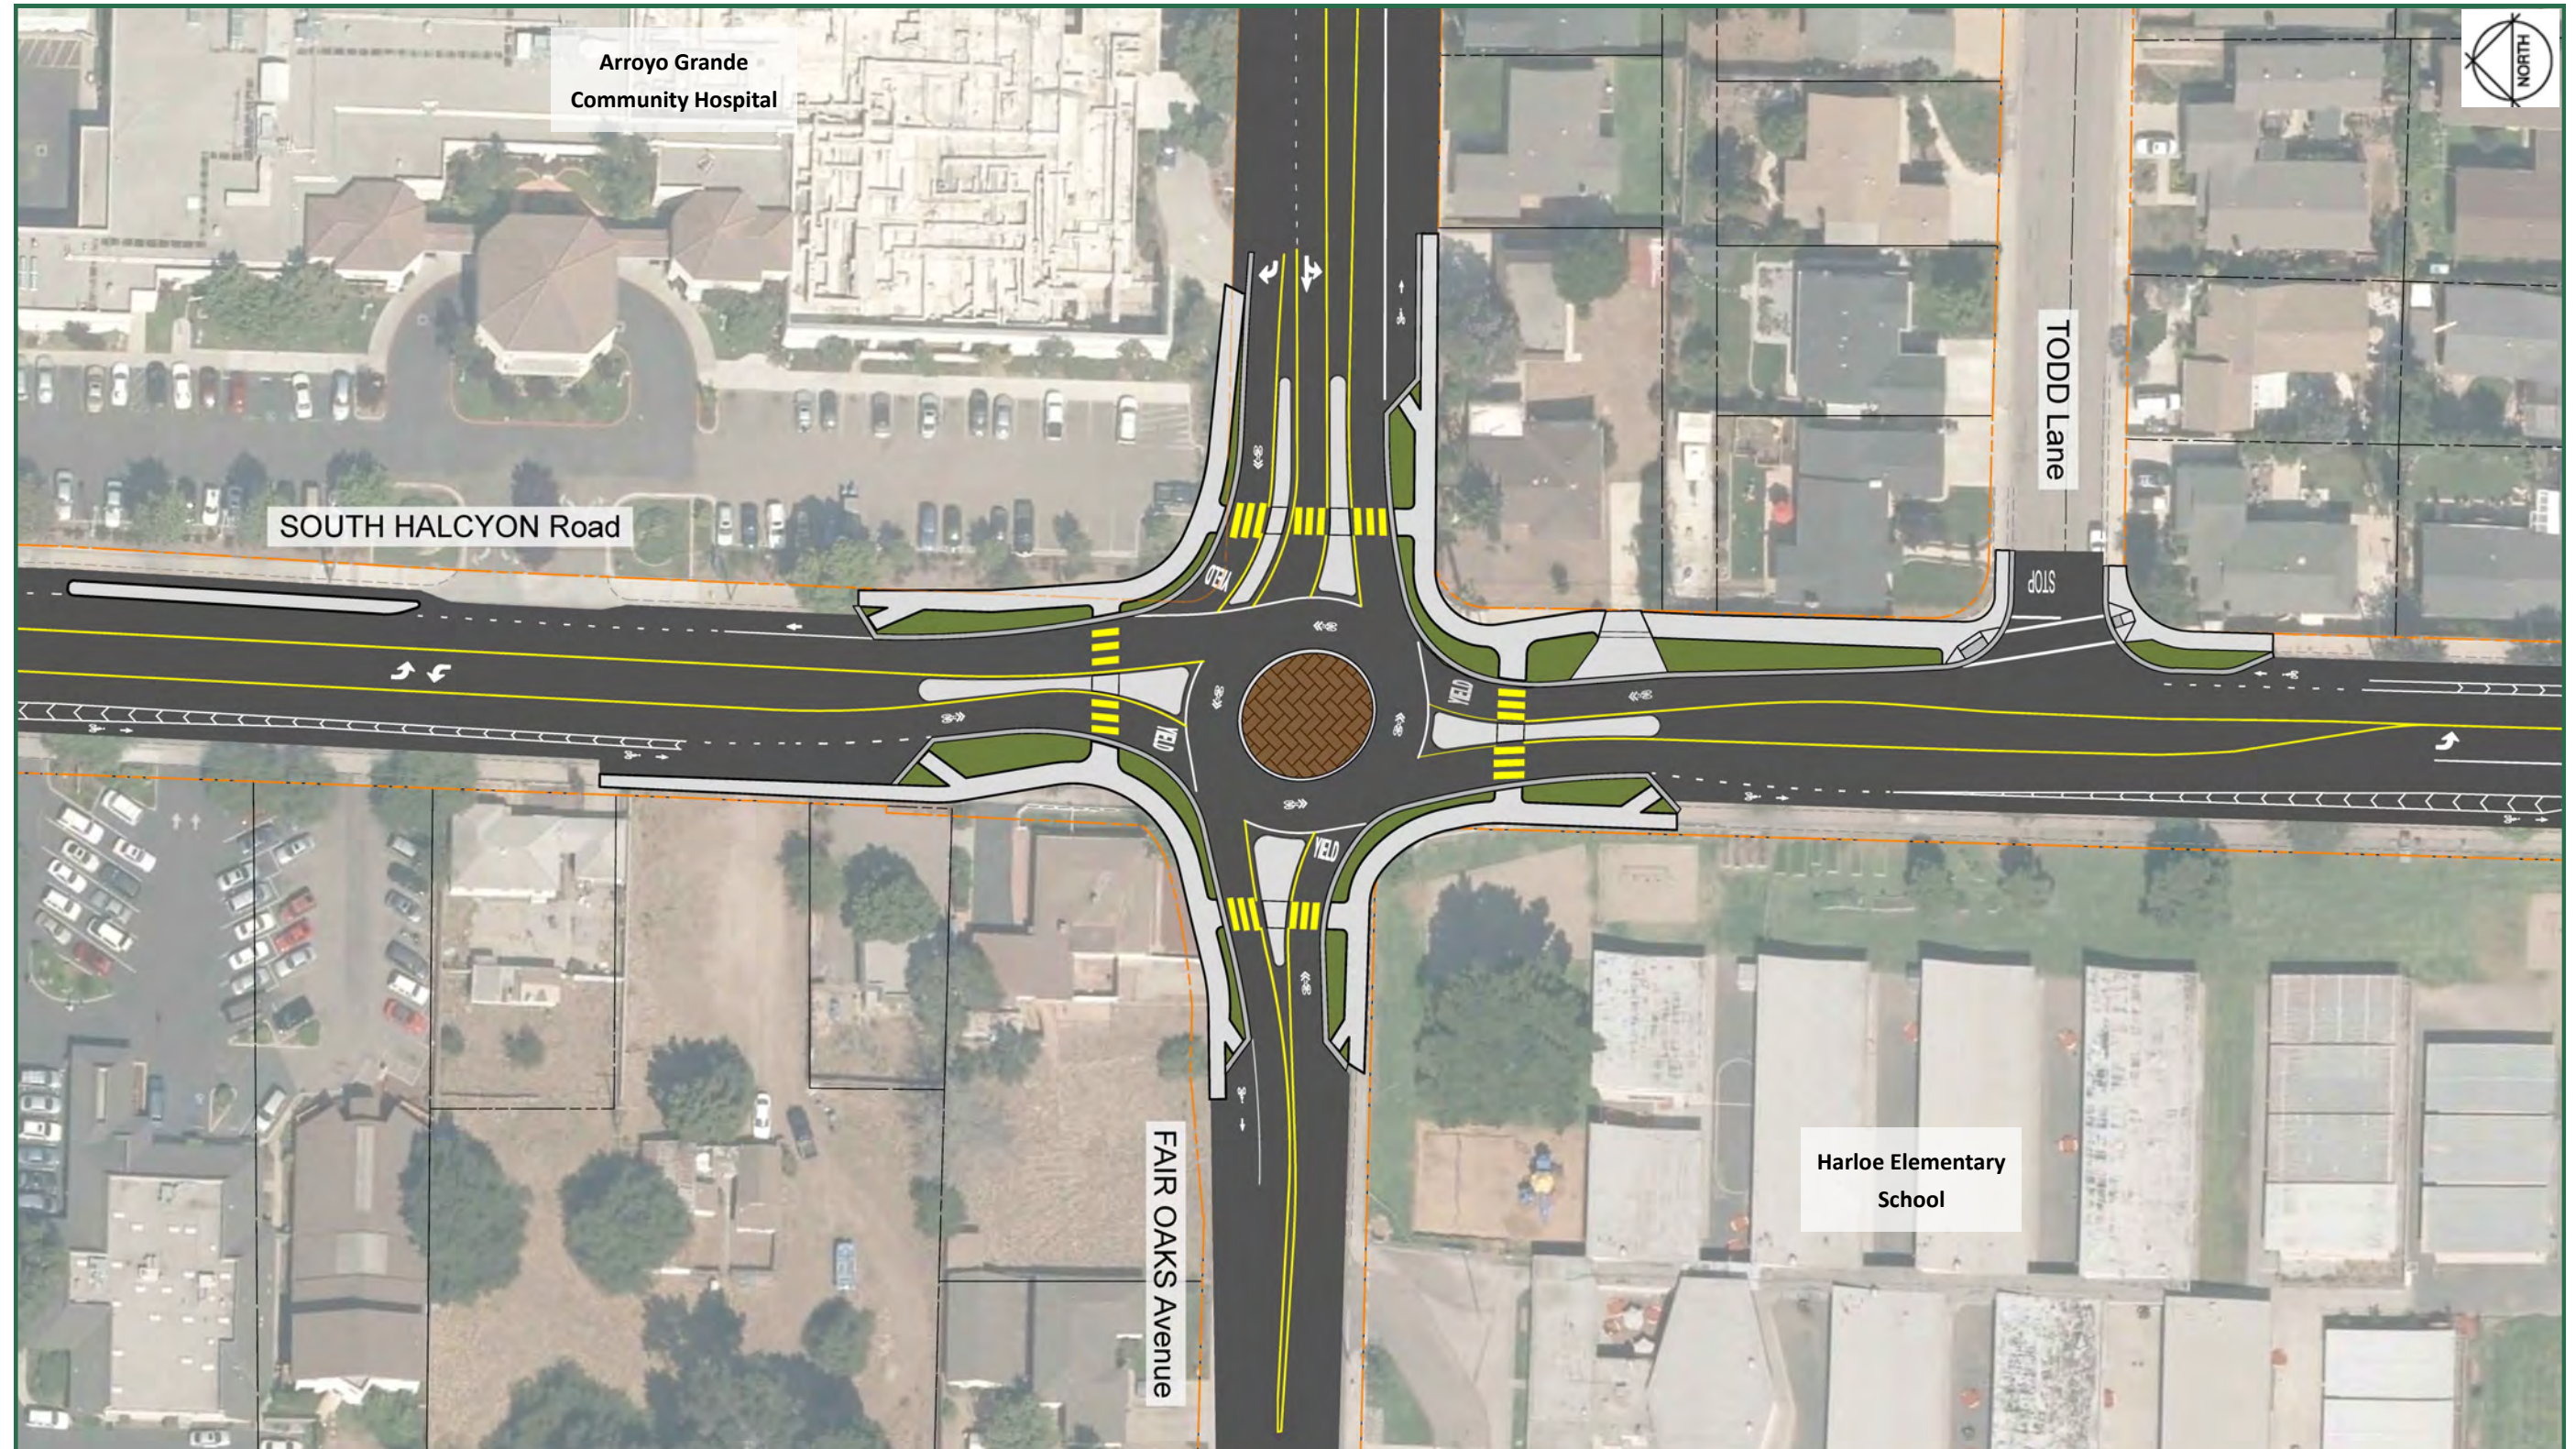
Alternative 2 Lane Geometrics (Compact Roundabout at Halcyon Road and Fair Oaks Avenue)
